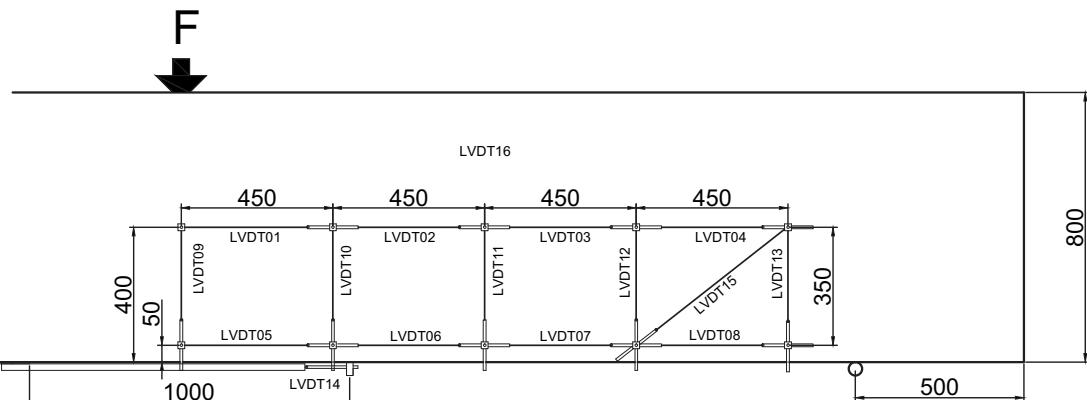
LVDT layout and numbering for 800 mm deep beams
